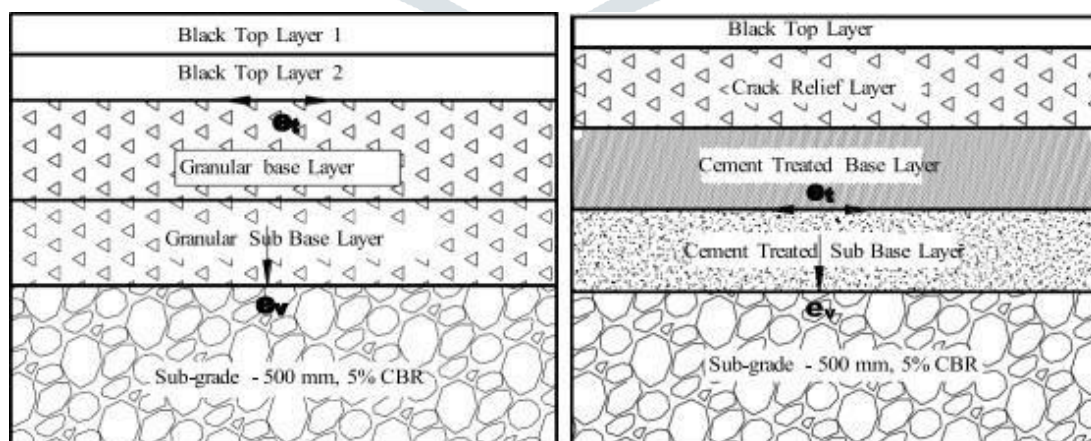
Pavement Composition of Conventional and Inverted Pavement
